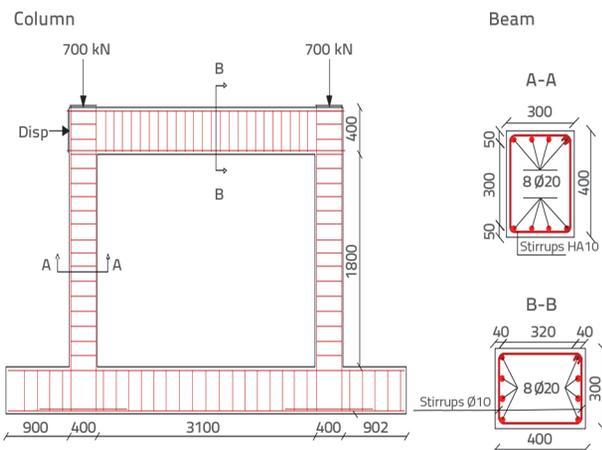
Geometrical view of single-storey portal, sections, reinforcing details and loading
